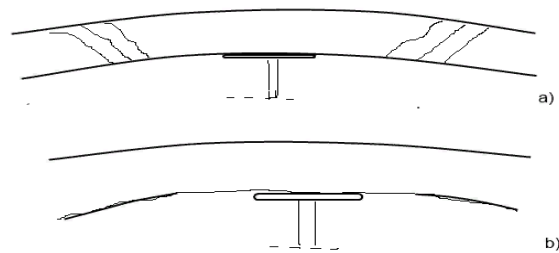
Failure mode of a continuous sandwich panel under thermal load at intermediate supports. a) Core deformation, b) face wrinkling
